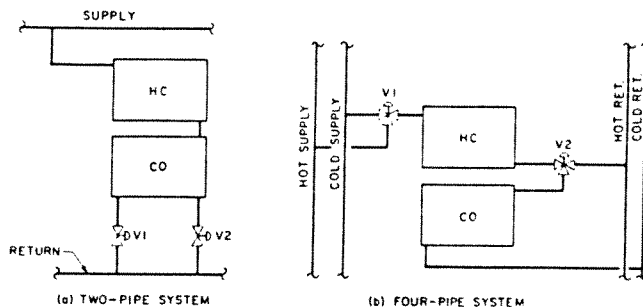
Split Panel Piping Arrangement for Two-Pipe and Four-Pipe Systems
